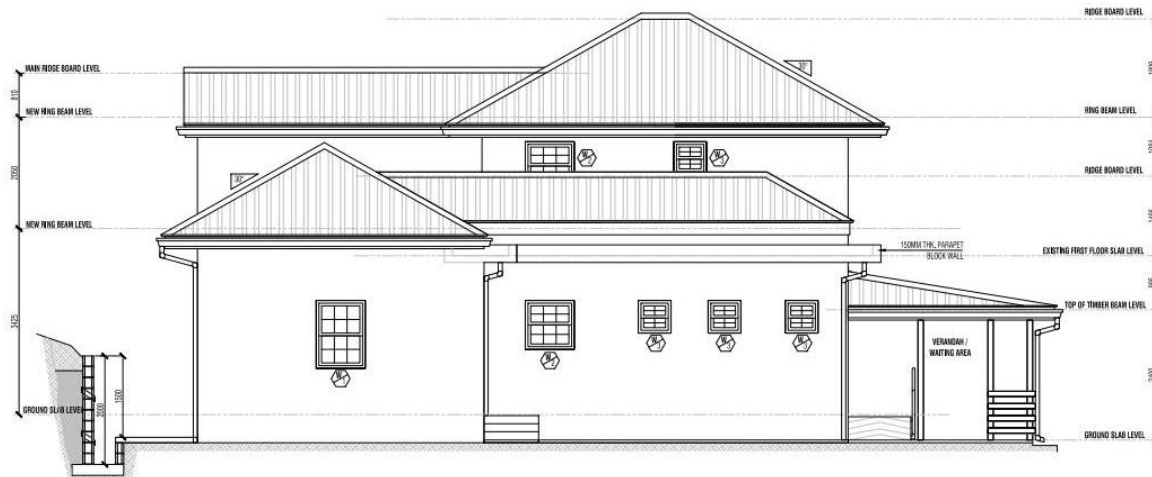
Proposed Elevation 1 (Source: compiled by author)
